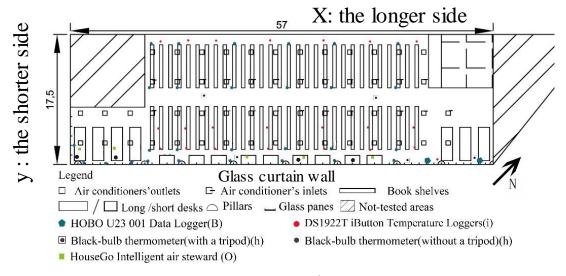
Floor plan of the Sun Yat-sen University Library in Zhuhai (8th floor)
